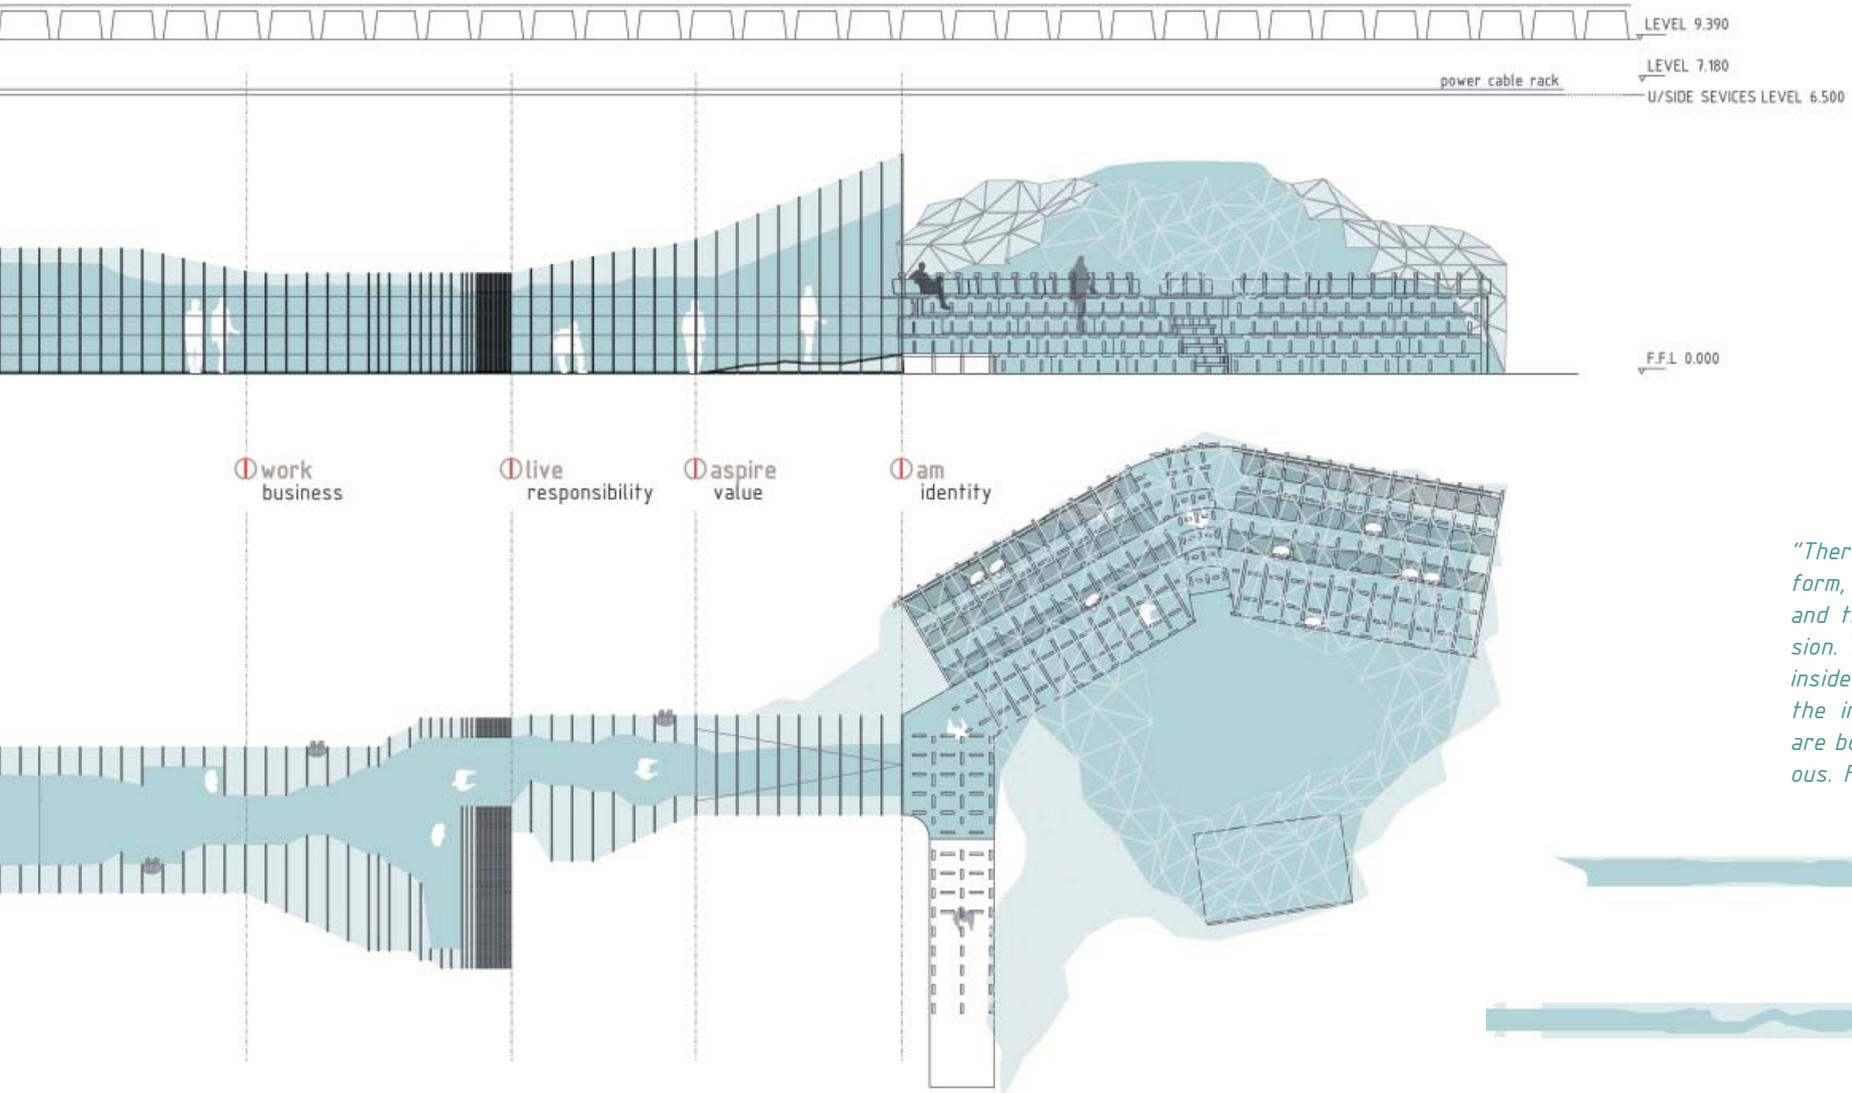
Final proposal for IFI Interiors Installation in linear form: elevation and plan
